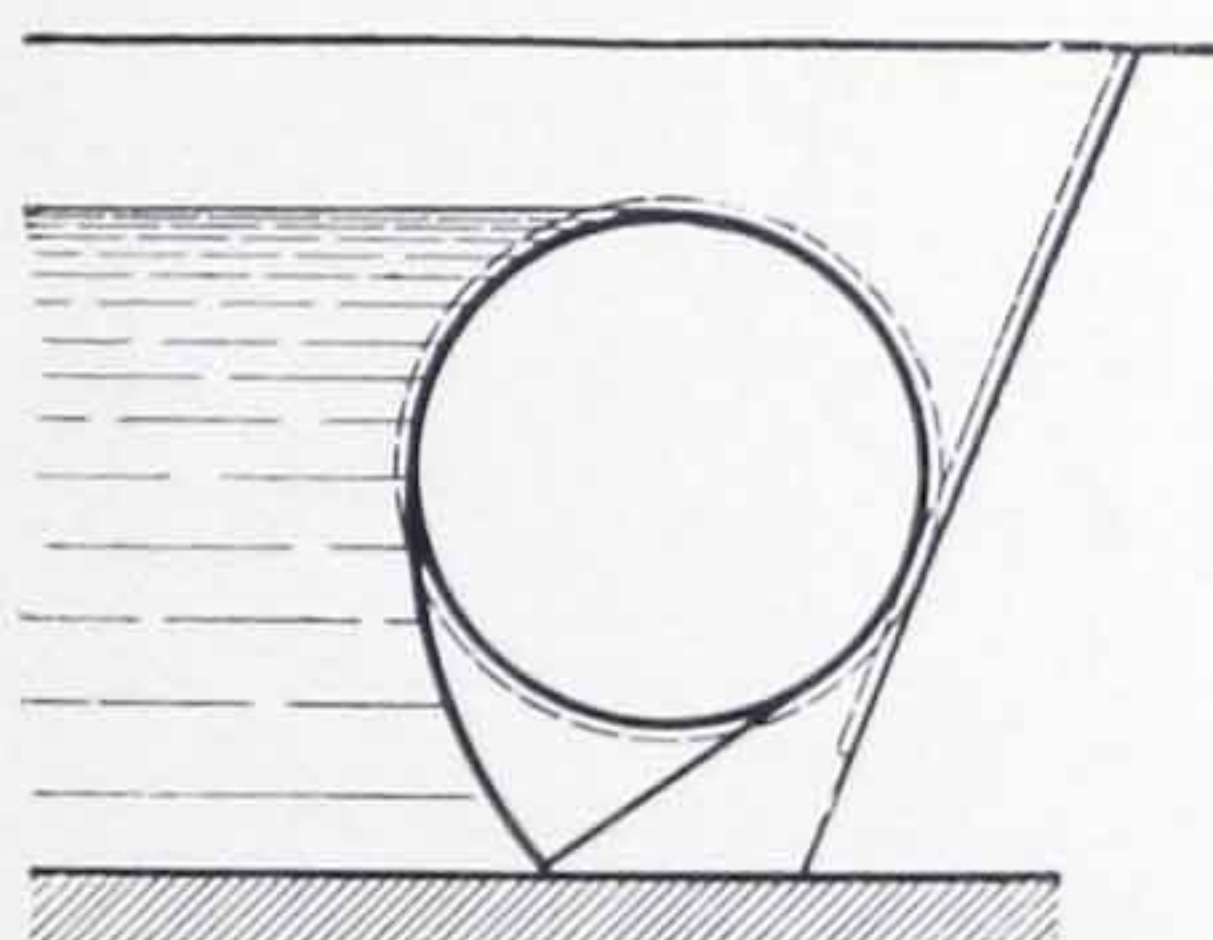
Roller with "Beak" attachment for a larger damming height compared to the clear span.
